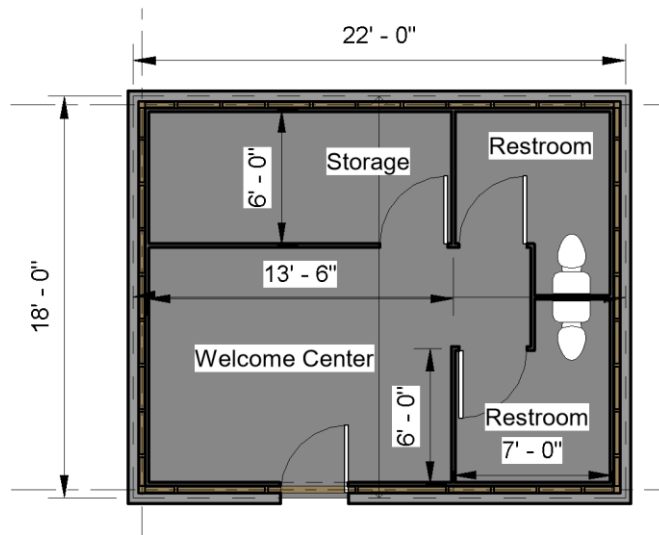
Restroom Alternative 1: Storage Room Renovation Floor Plan
